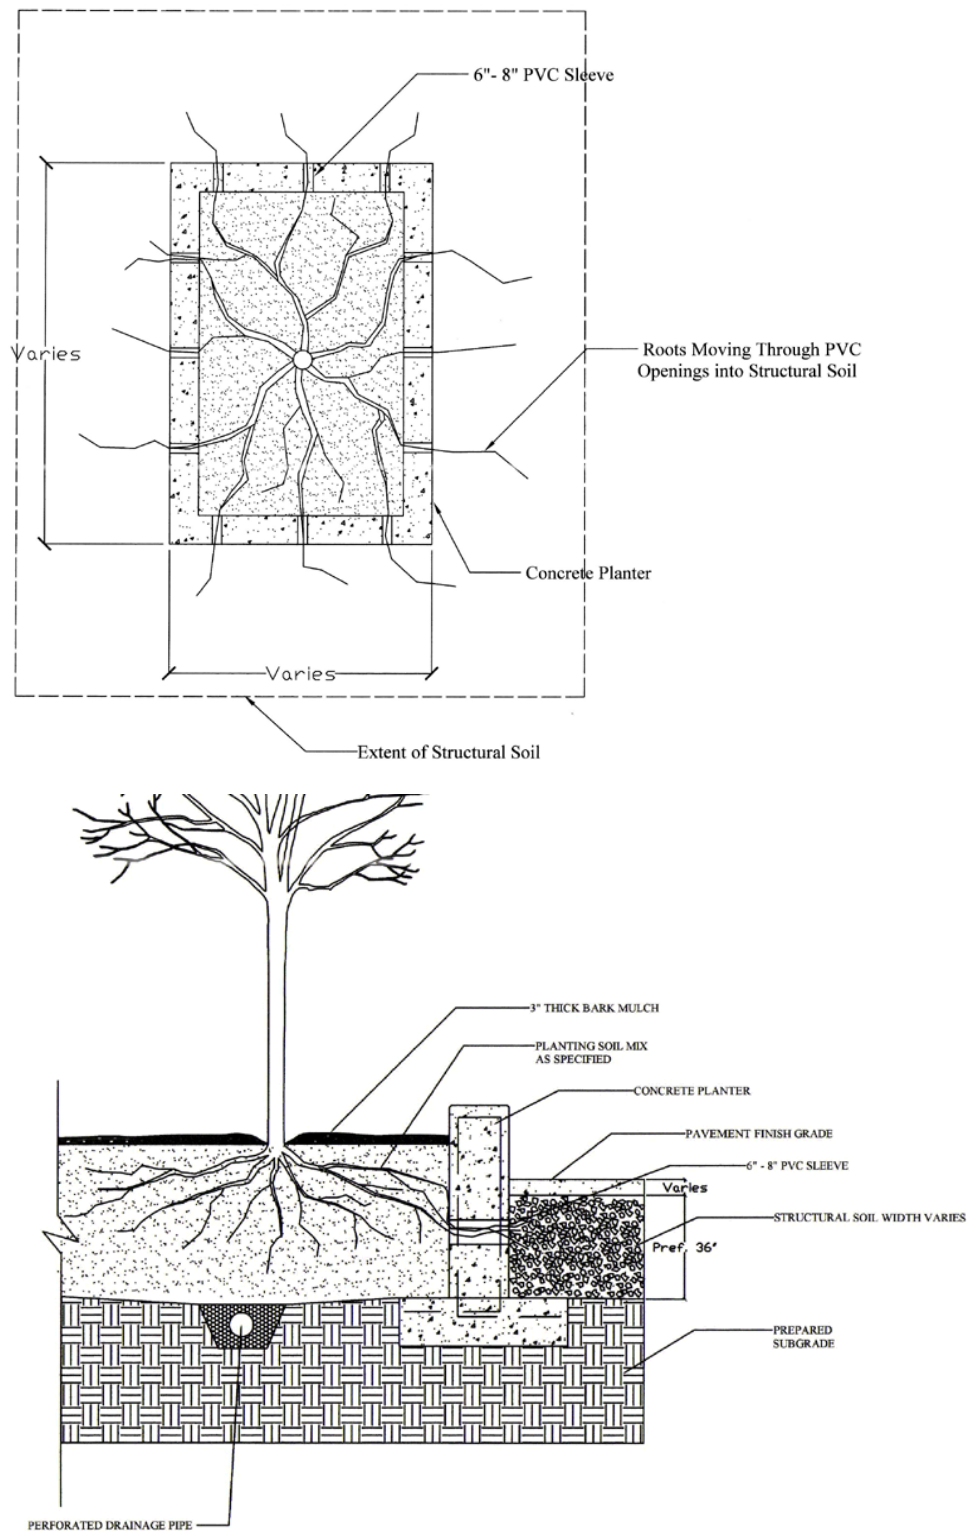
Roots move through PVC openings in concrete planter box wall into structural soil under pavement (Urban Horticulture Institute 2007).
